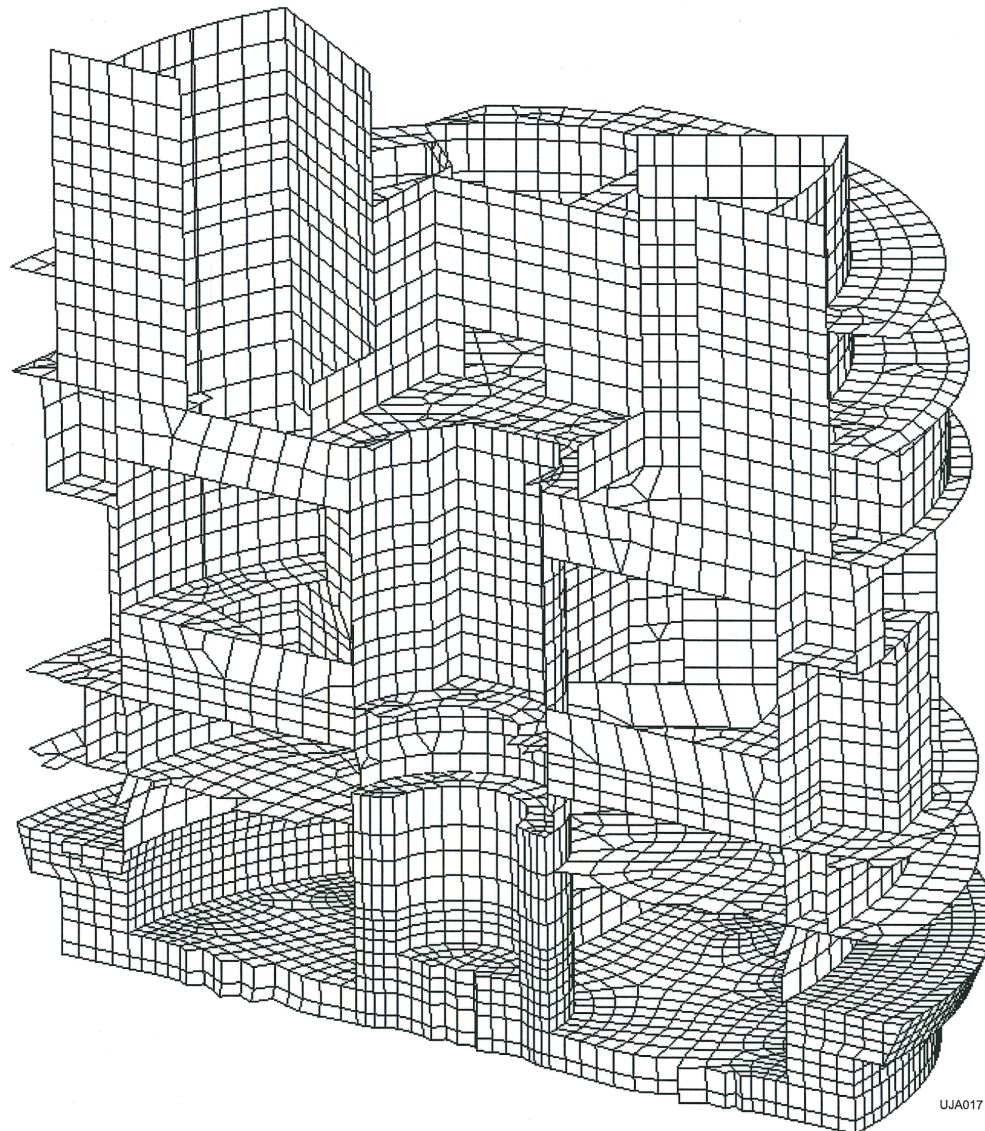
Reactor Building Internal Structures ANSYS Model – Section through Center of Building Looking Northwest
